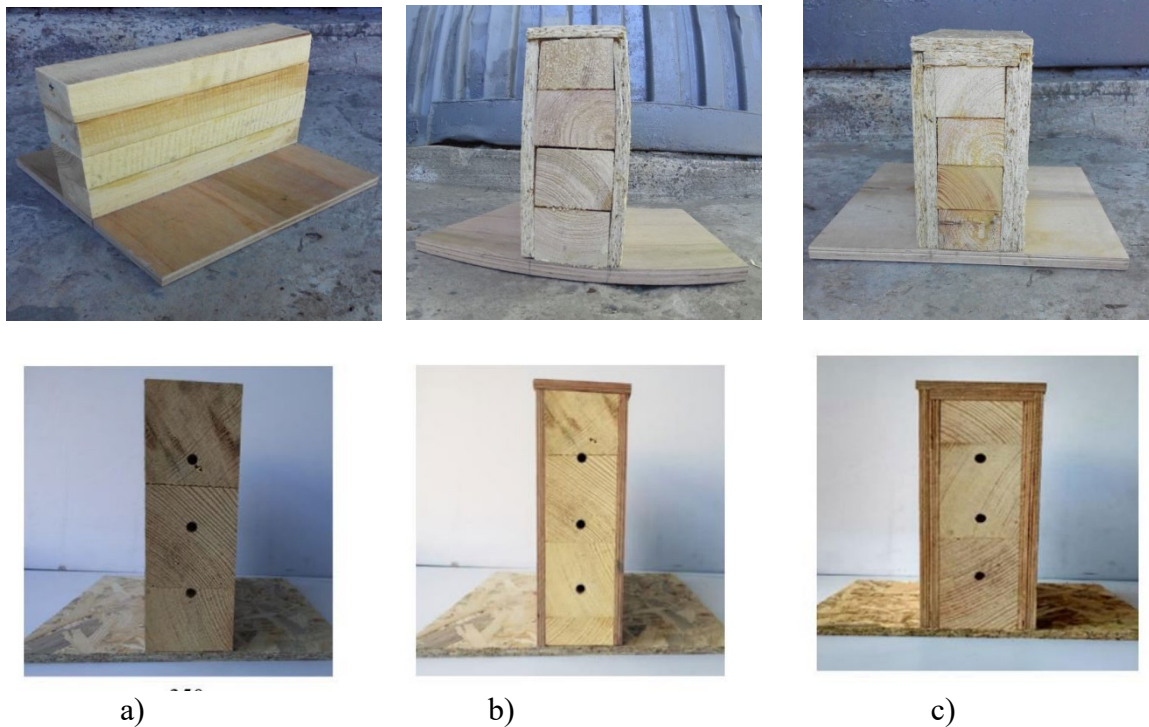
General view of experimental specimens with fire-retardant cladding made of OSB board and impregnated plywood: a) wooden beam without fire protection; b) wooden beam with 1st layer of fire-retardant cladding; c) wooden beam with 2nd layer of fire-retardant cladding
